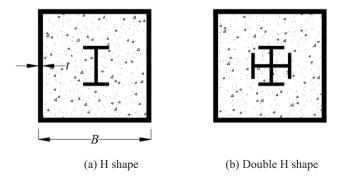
Cross-sections of steel-reinforced concrete-filled steel tubular columns. (a) H shape. (b) Double H shape.
